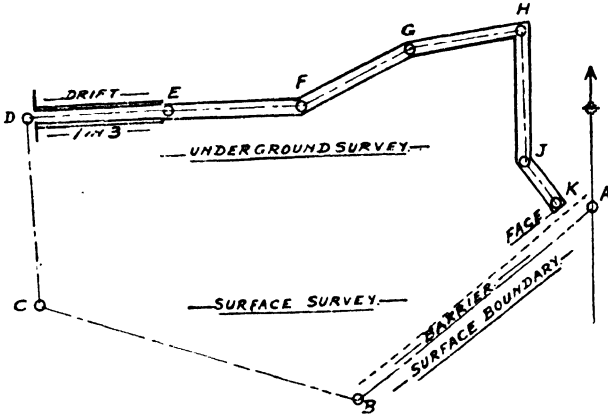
Sketch Plan showing Surface Boundary and Underground Workings.
